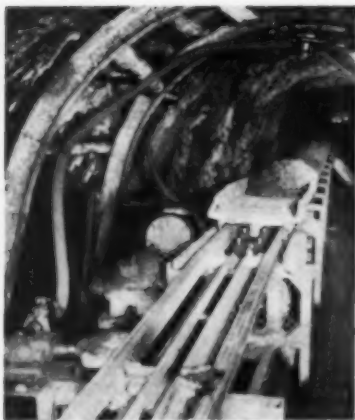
APRON-CONVEYOR "TRAIN" approaching drive.
